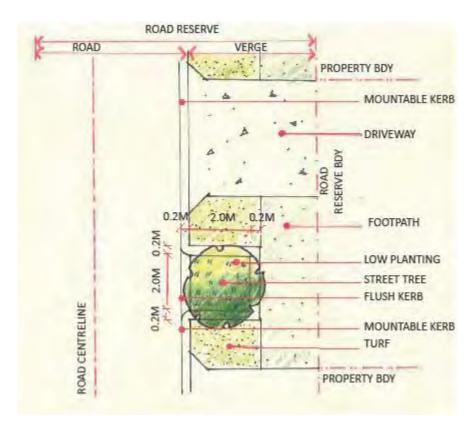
Typical layout plan – with footpath (Scale 1:50@A3)
